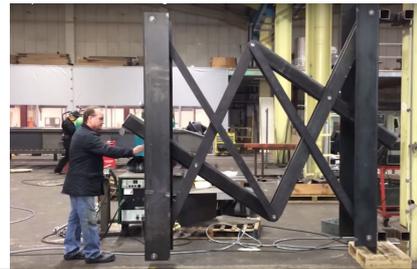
Ten Fold Technology scissors mechanism - testing prototype
